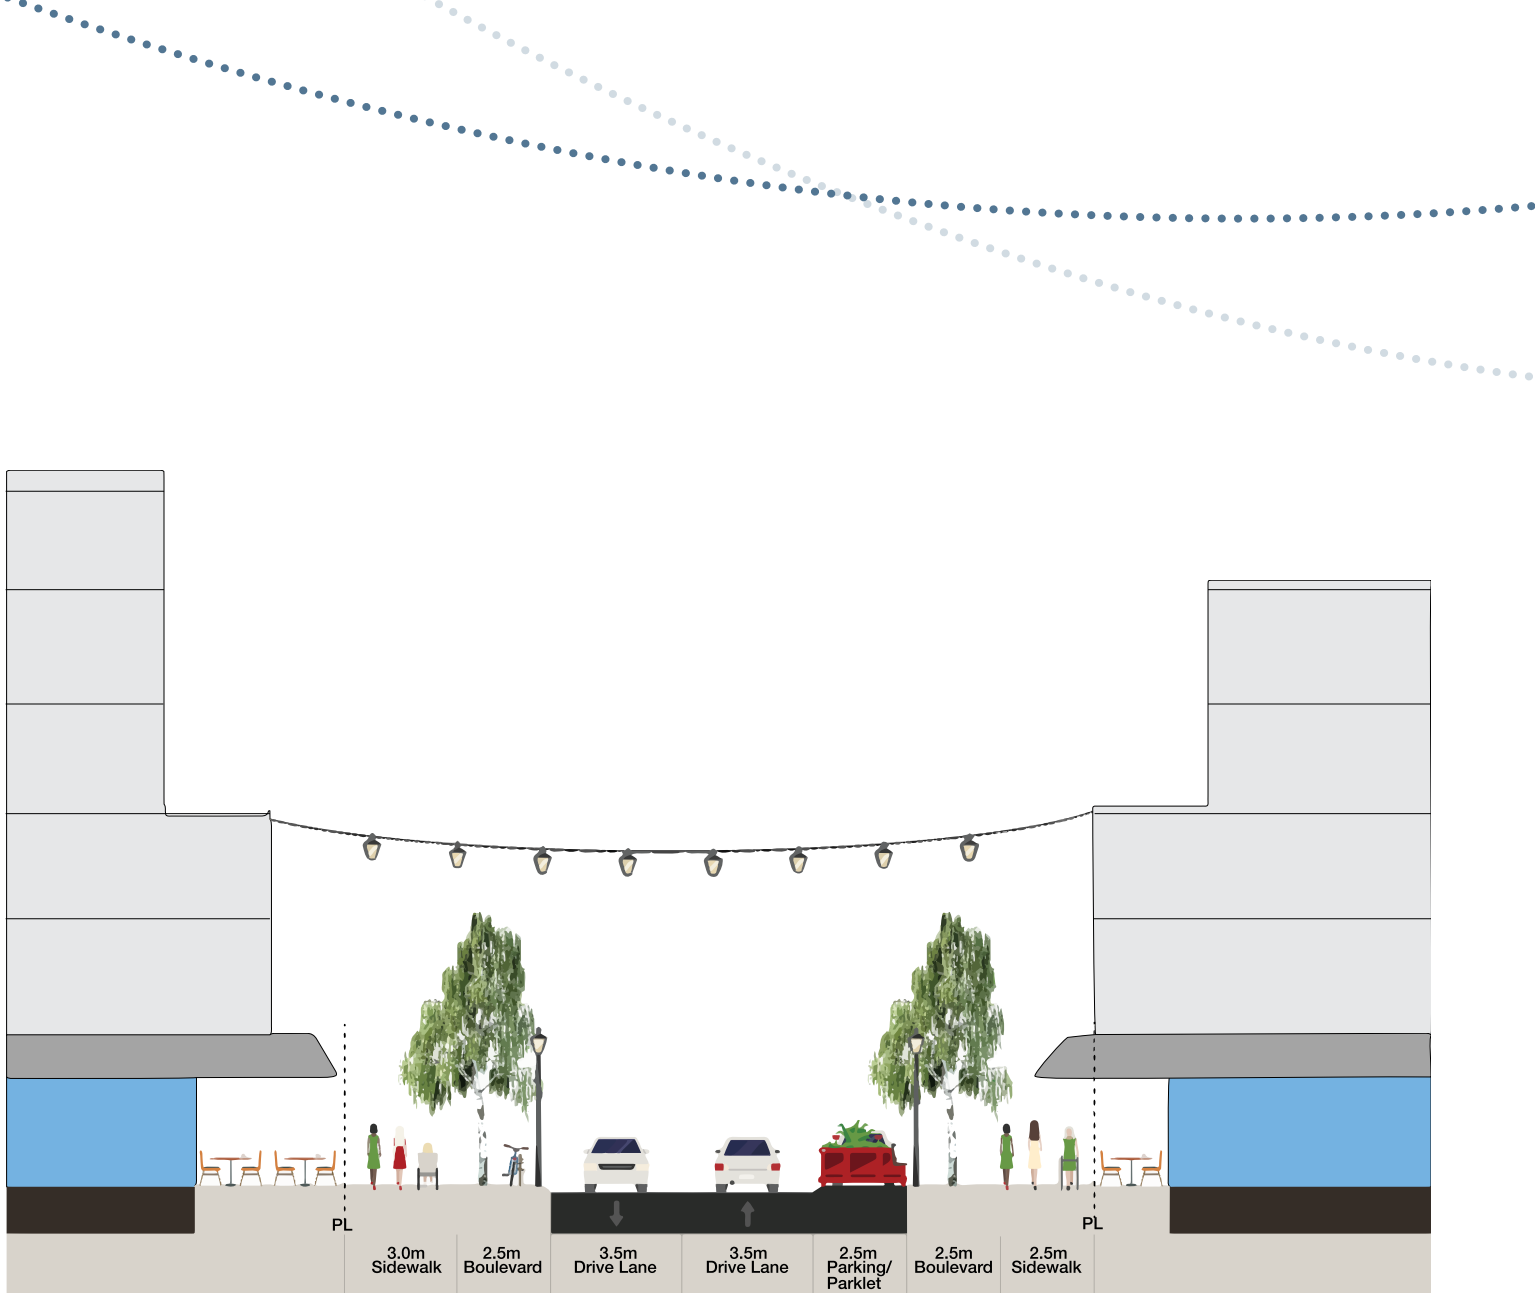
Conceptual cross section for Oak Street (20 metres)
